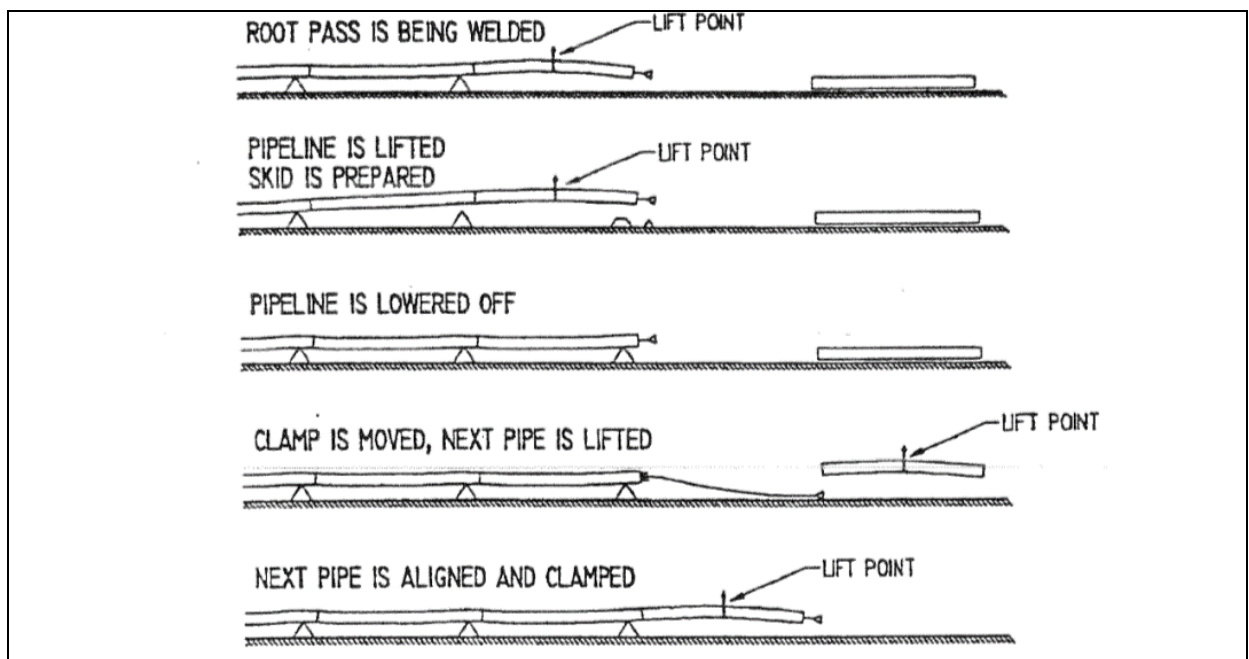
Welding sequence employed in pipeline construction [14]
